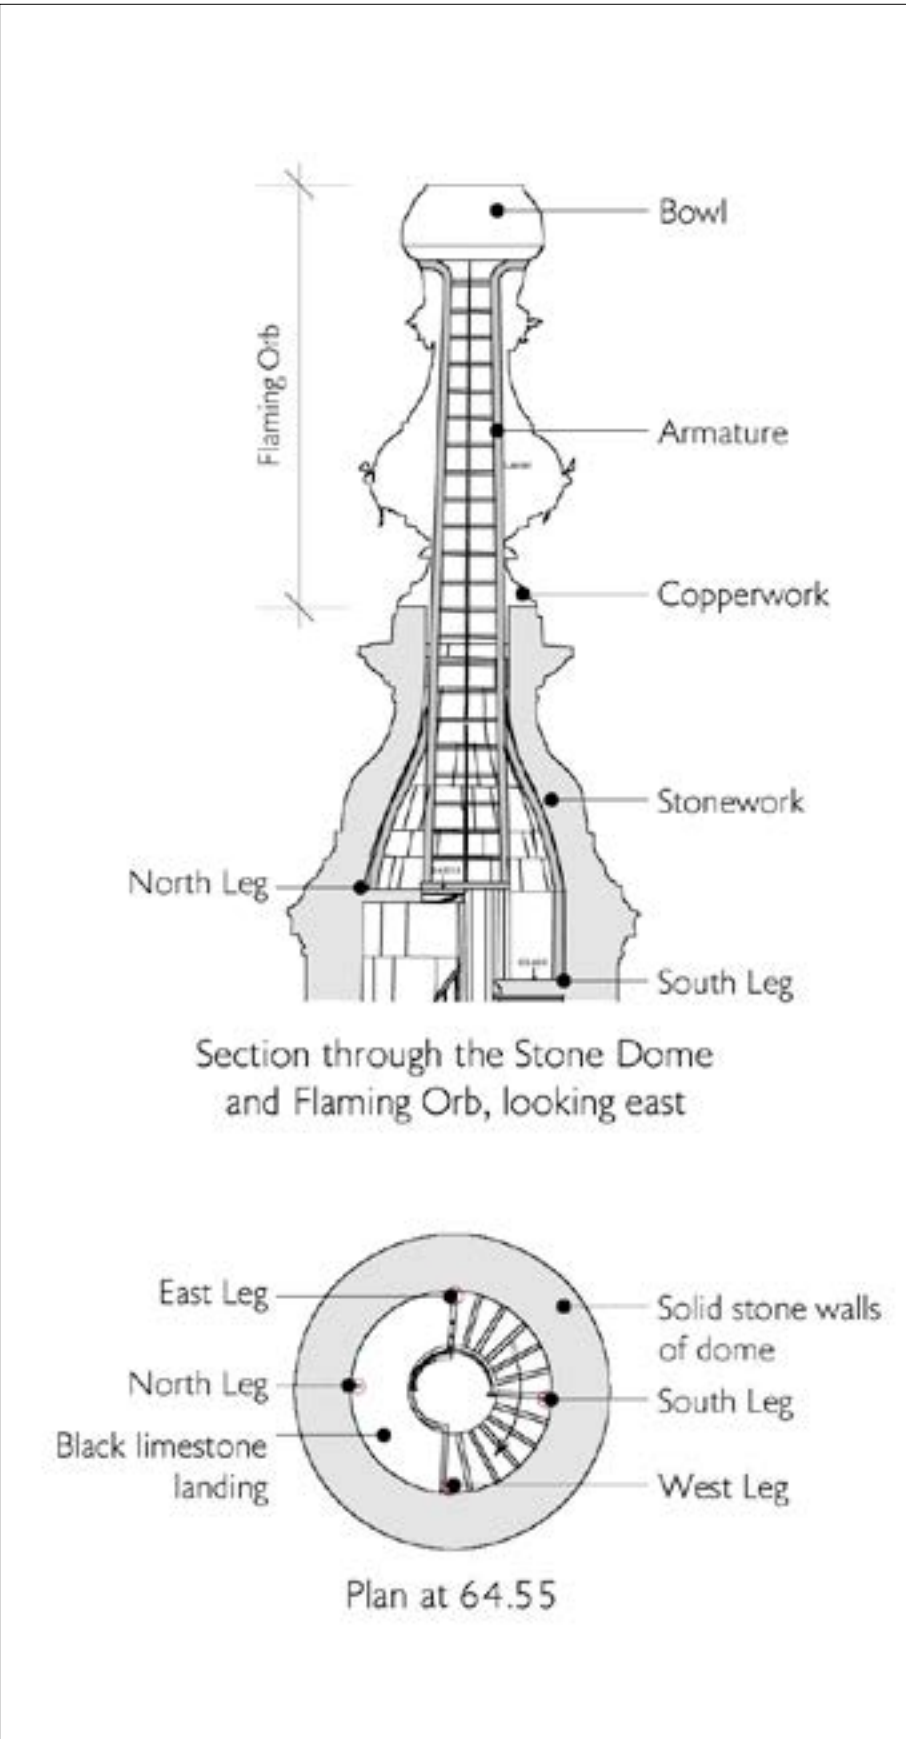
Section through the flaming orb, stone dome and drum, and plan through the drum, showing the supporting wrought iron armature, 2006
